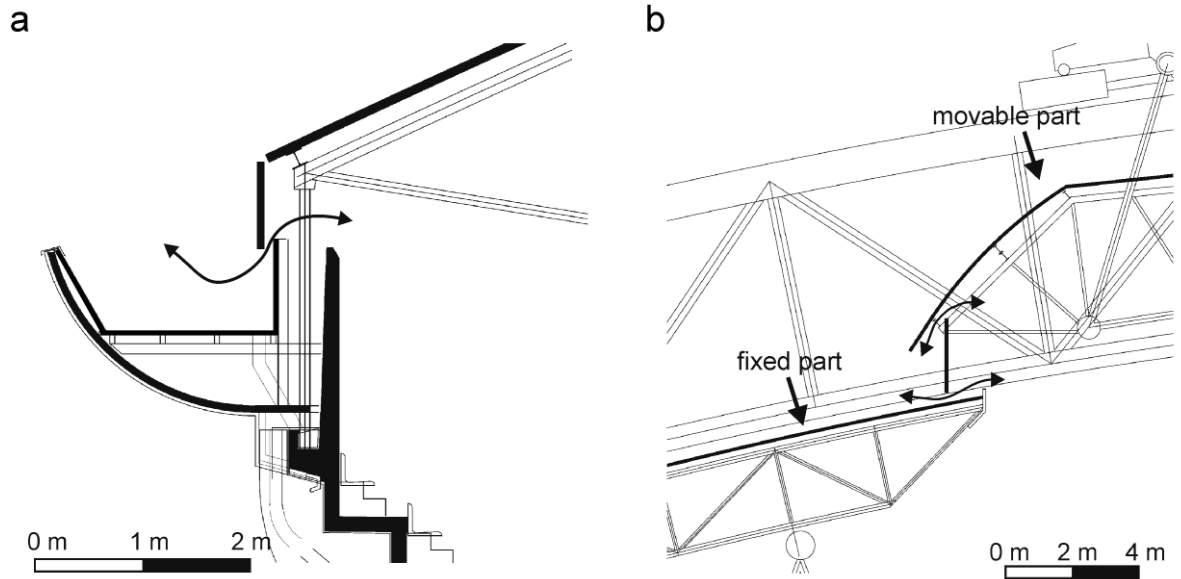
Cross-sections of the ventilation openings in the upper part of the stadium; (a) ventilation opening between the steel roof construction, the gutter and the concrete stand, present along the entire perimeter of the stadium (see nr. 6 in Fig. 4a); (b) ventilation opening between the fixed and movable part of the roof. This opening is only present at the two longest edges of the stadium (see nr. 7 in Fig. 4a).
